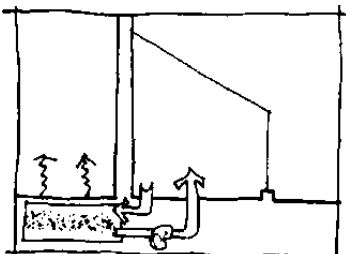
Heat transfer methods – sunspace to building (PUT)
